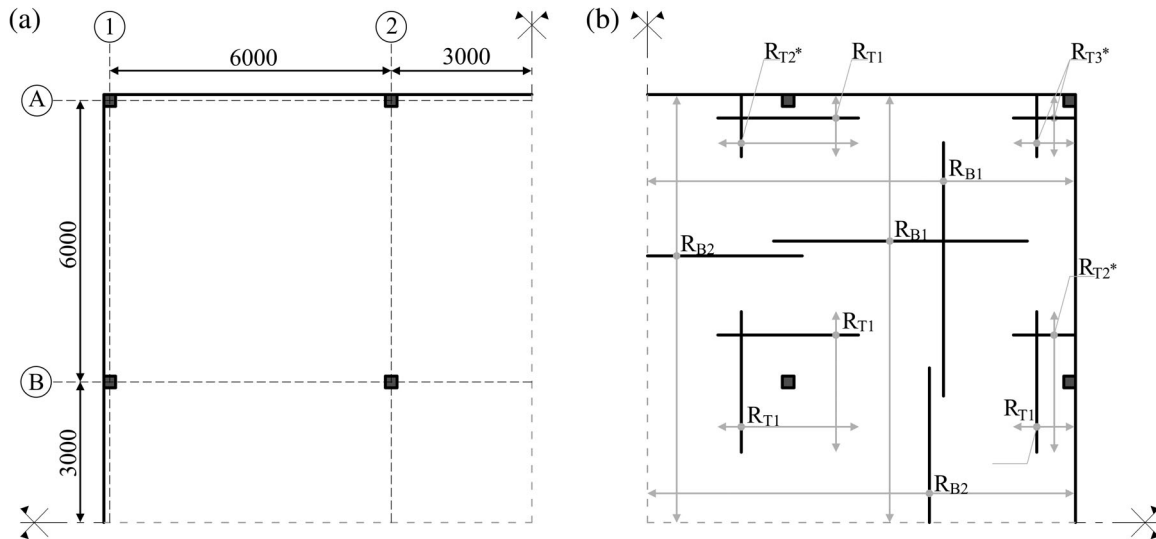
Analyzed HRC flat slab: (a) geometry and (b) reinforcement layout
